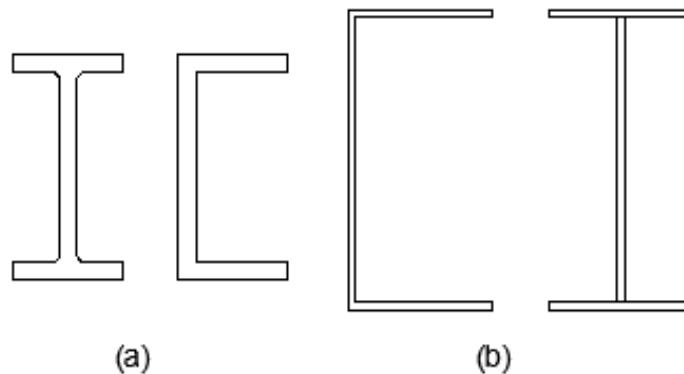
(a) Thick beam section, (b) Thin-walled beam section.
